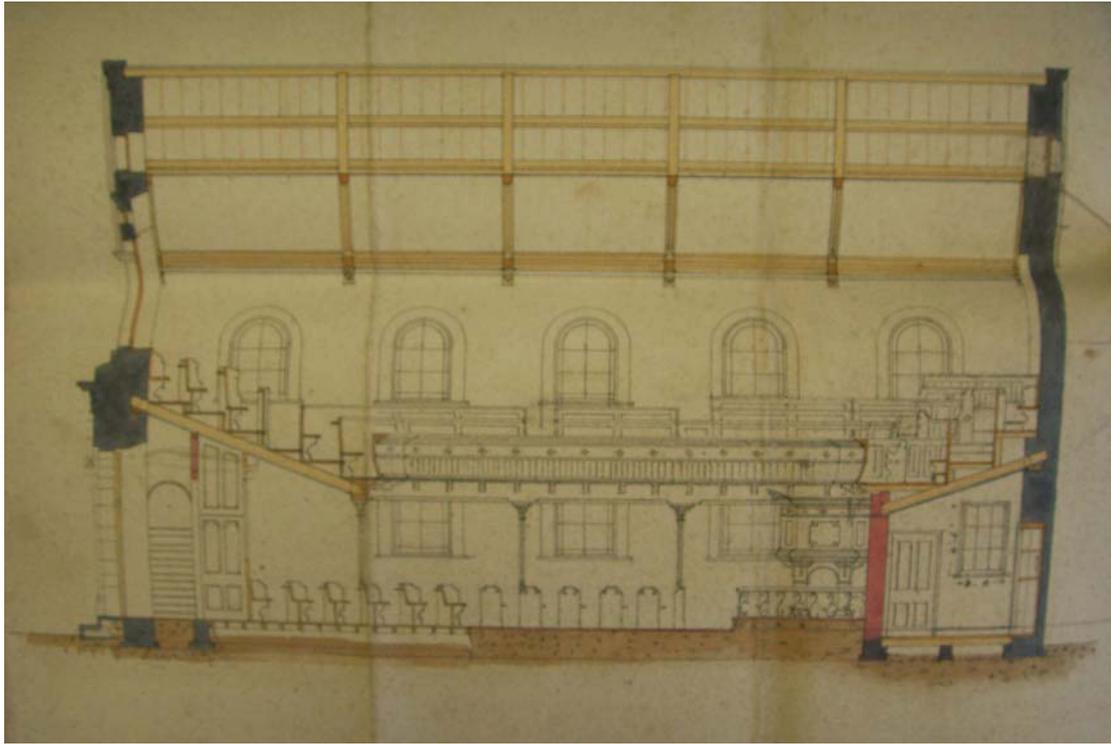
Long cross-section as proposed in original drawings of 1872 (CRO(B) Z1099 1872)
